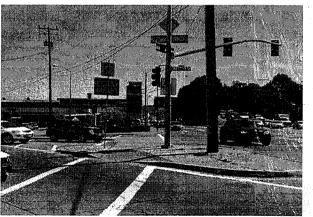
Segment O (Looking South at Jerrold Ave. and Bayshore Blvd.)
